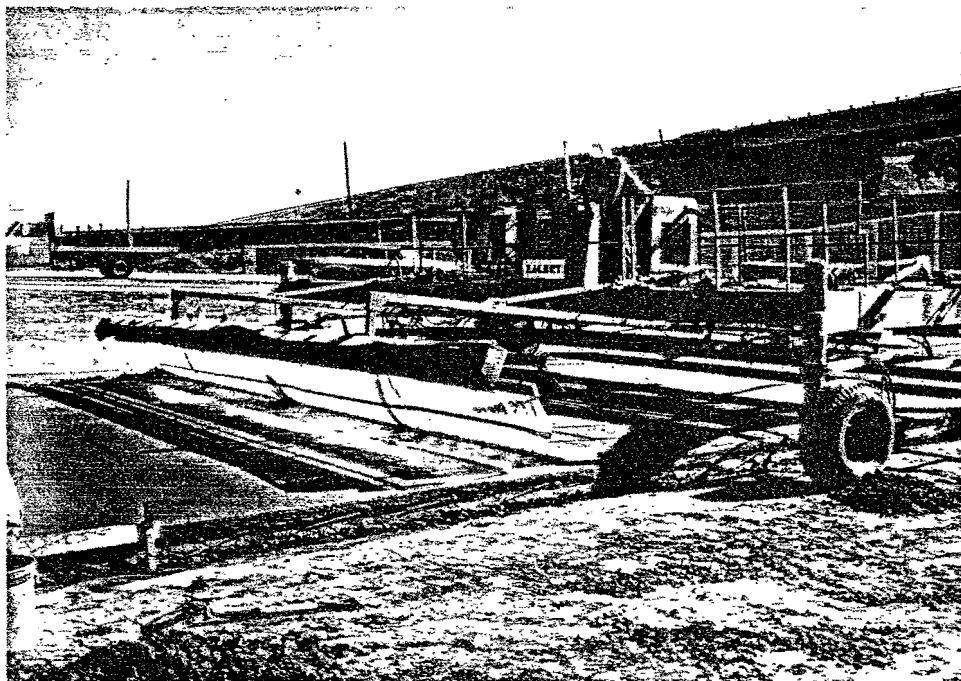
Longitudinal Tines Texturing Machine on Loop 12, Dallas Co. (Test Site 11).
